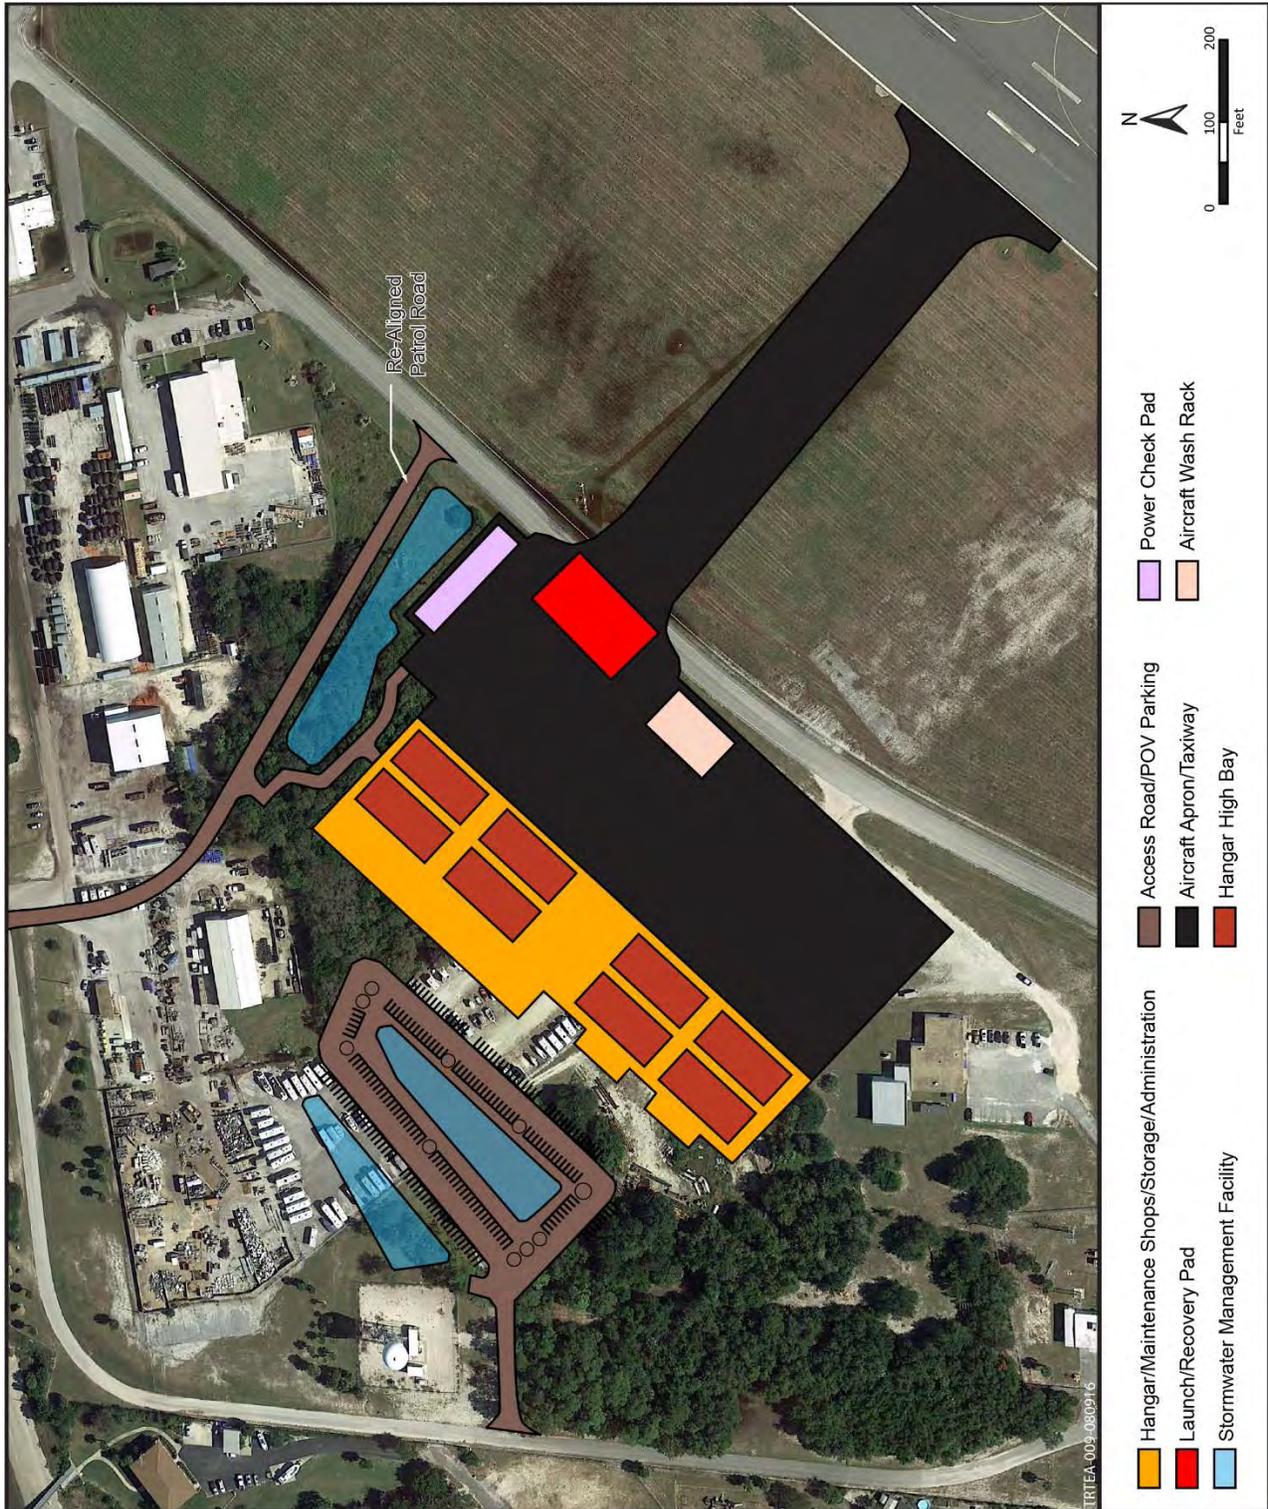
Naval Station Mayport (Alternative 2) Project Area
